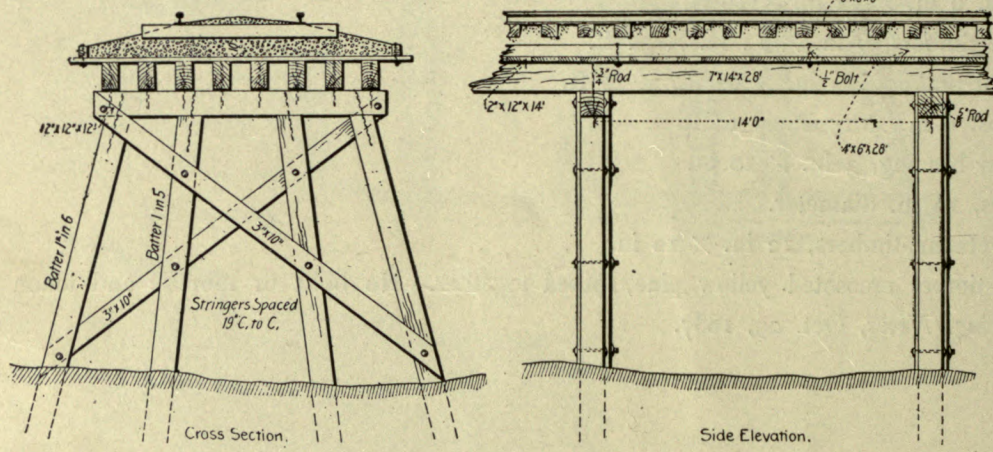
PLATE VIIIa.—TRESTLE WITH BALLASTED FLOOR, HOUSTON & TEXAS CENTRAL R. R.
